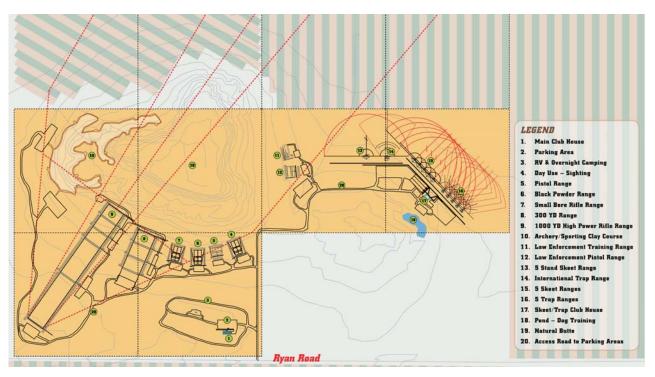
Site Plan for GFSSC (CTA Architects Engineers)
